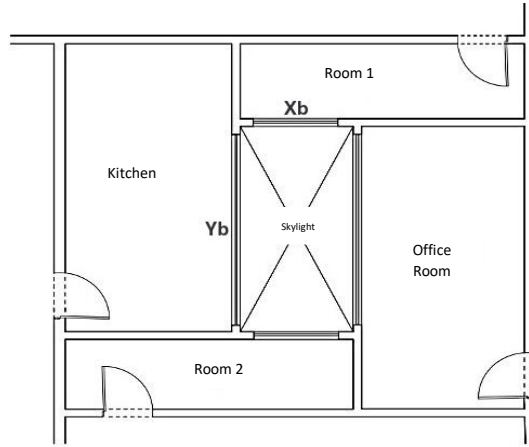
Partial plan sketch of building B (B Binasının Kısmi Planı)
